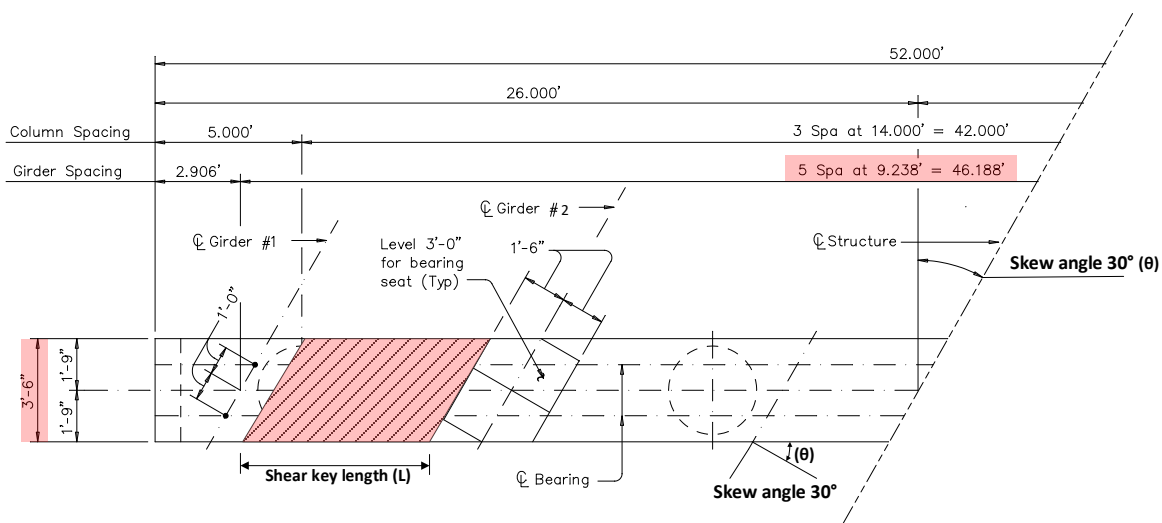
Bent cap for 44-ft roadway 30-degree skew I-girder bridge
